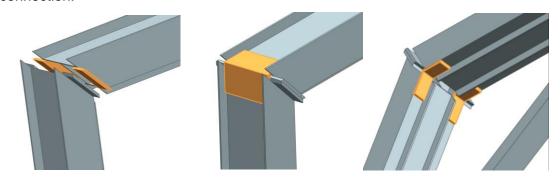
Vertical Profile–Top Beam 90° Connections – Brackets 2.1 and 2.1.1, 3.1 and 3.1.1's
